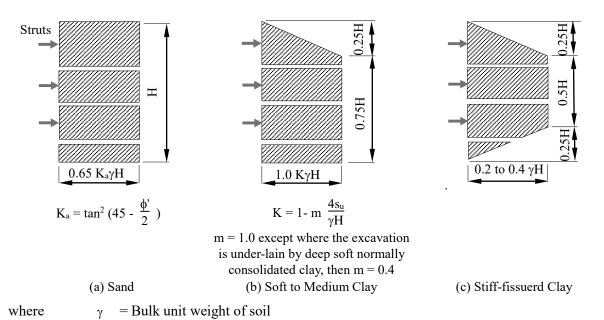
Apparent Pressure Diagrams for Computing Strut Loads in Strutted Excavations (modified form Peck, 1969)
